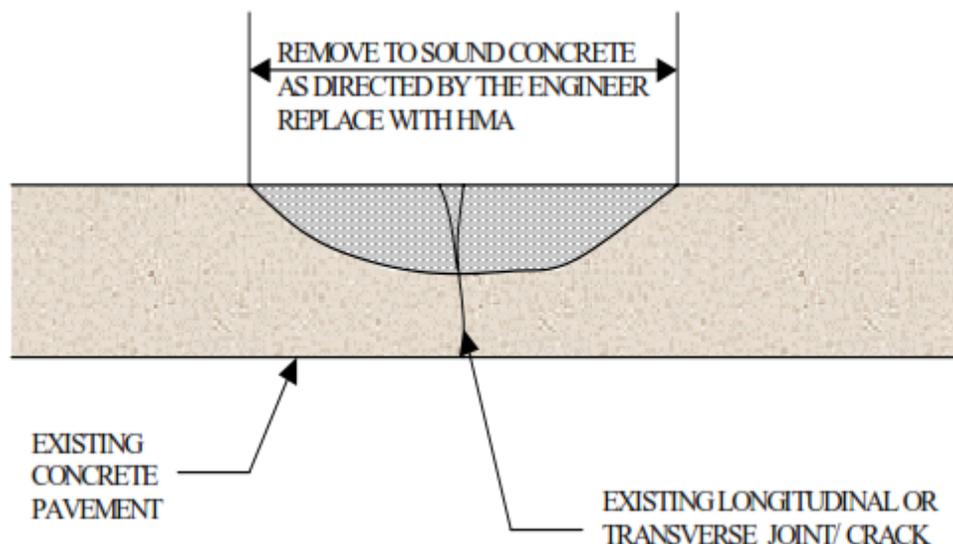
Partial depth repair of spalling around a joint or crack (from Wen et al. 2005)
